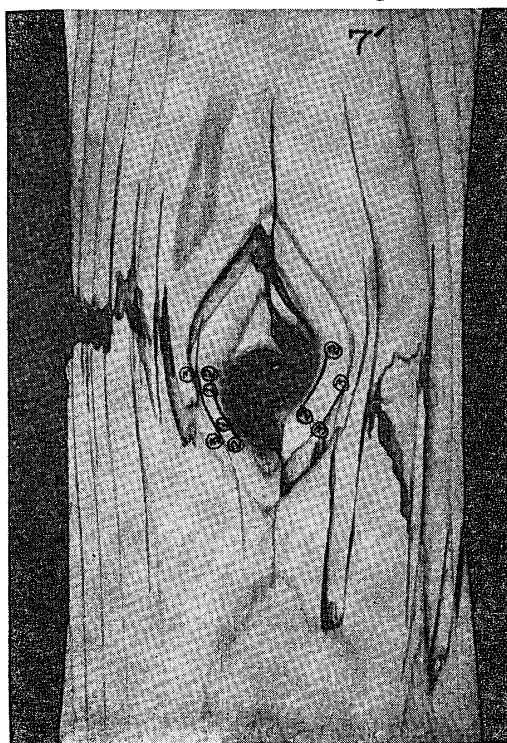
Pith side face of knotty specimen after failure test (Specimen No. 7).
